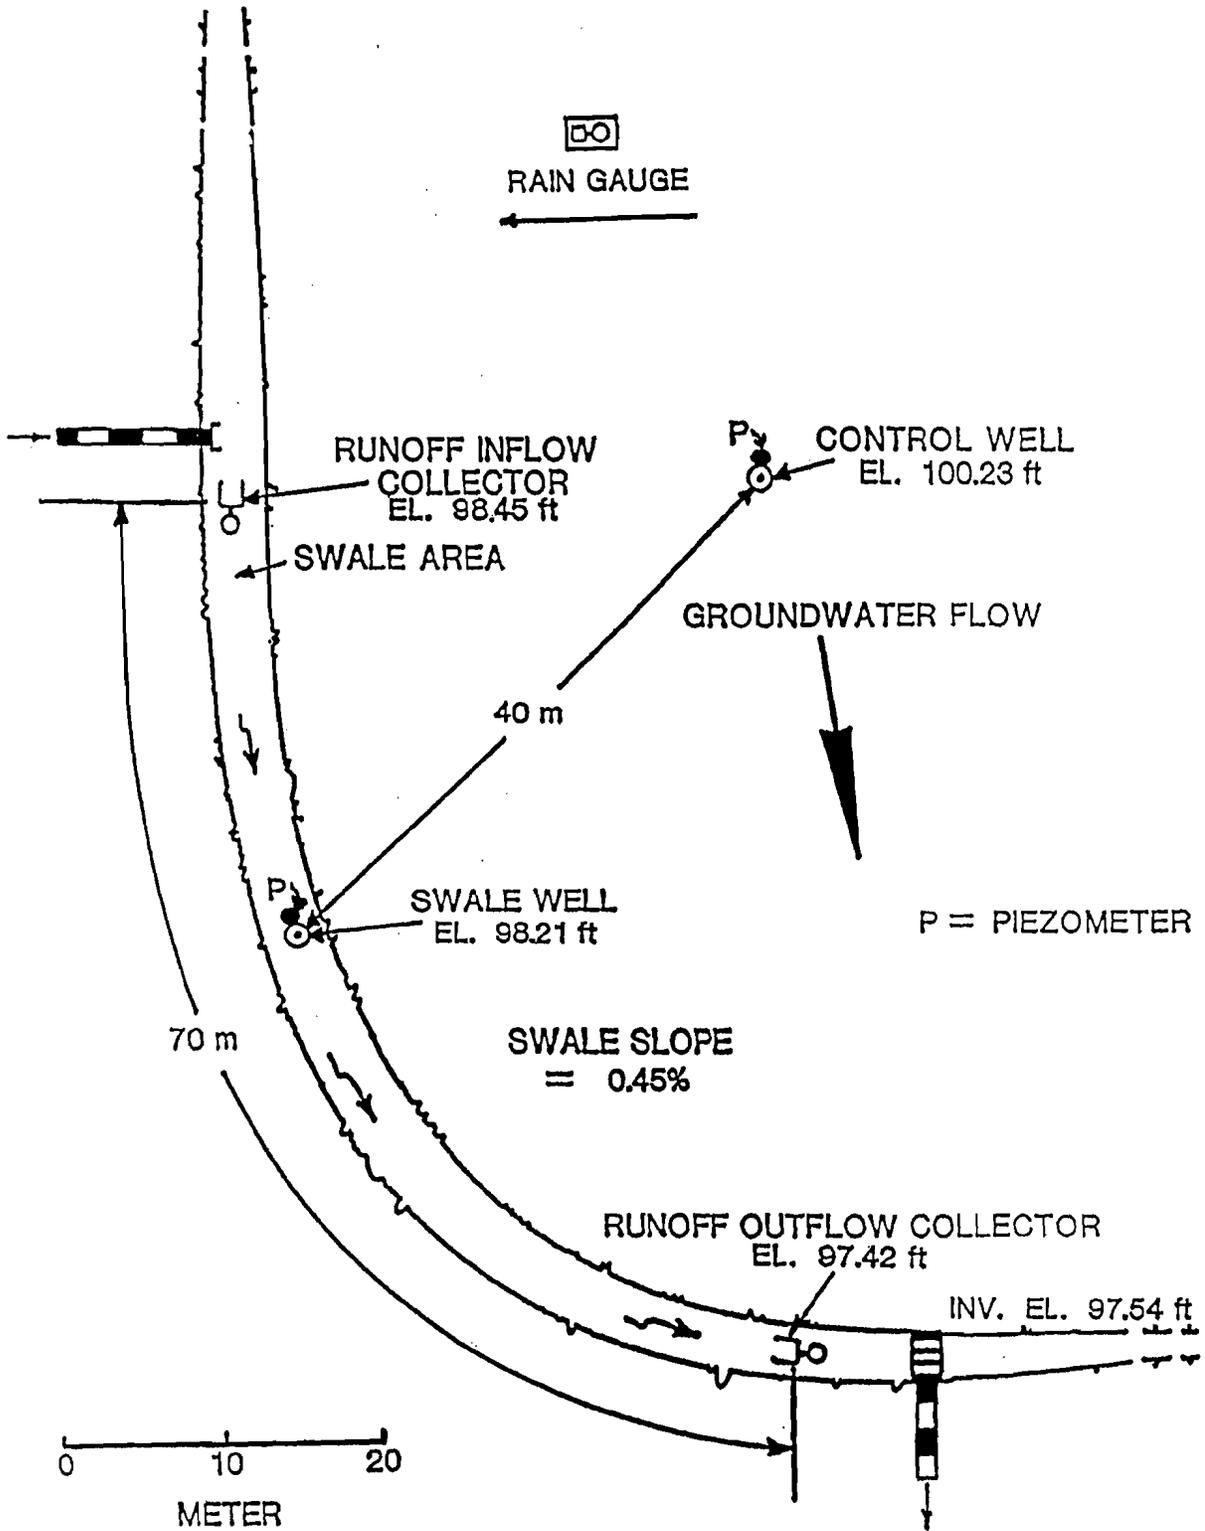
Field Instrumentation at the Dry Swale Site - Site 2.
